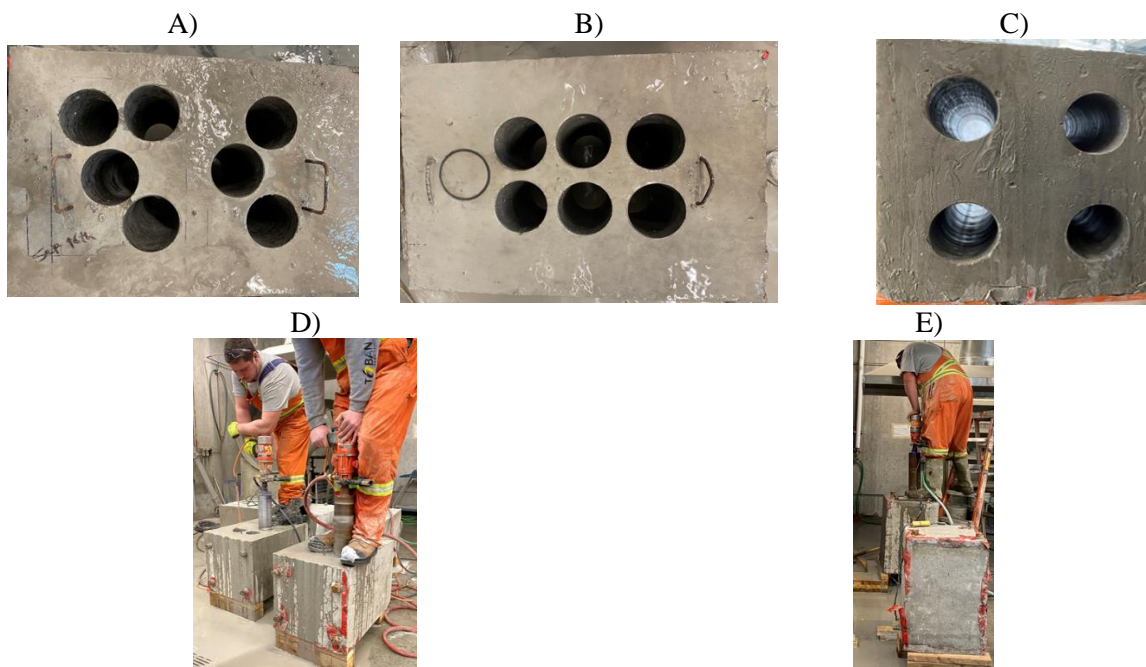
Concrete blocks cored in the direction of A) Vertical, B) Transverse, C) Longitudinal, D) process of coring extraction in vertical and transverse and E) Longitudinally direction.
